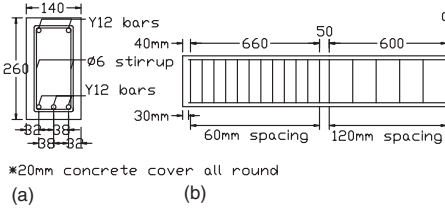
(a) Cross-section dimensions of beam specimens. (b) Side elevation of half of concrete beam.
